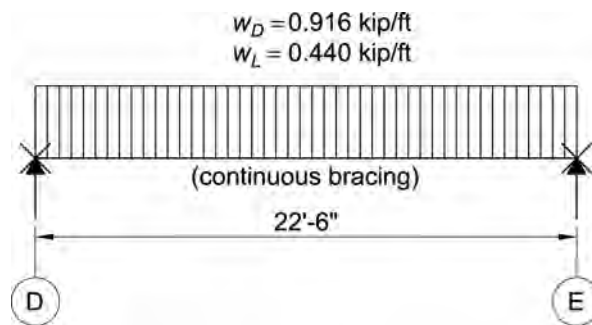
Loading and bracing diagram for typical north-south floor beams.
